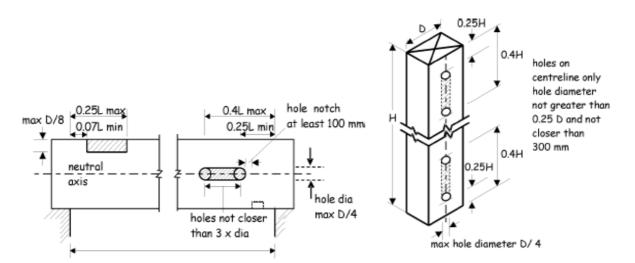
Notches and hole locations in timber floor joists and studs *Source: Domestic Technical Handbook, Section 1 Annexes E and F
